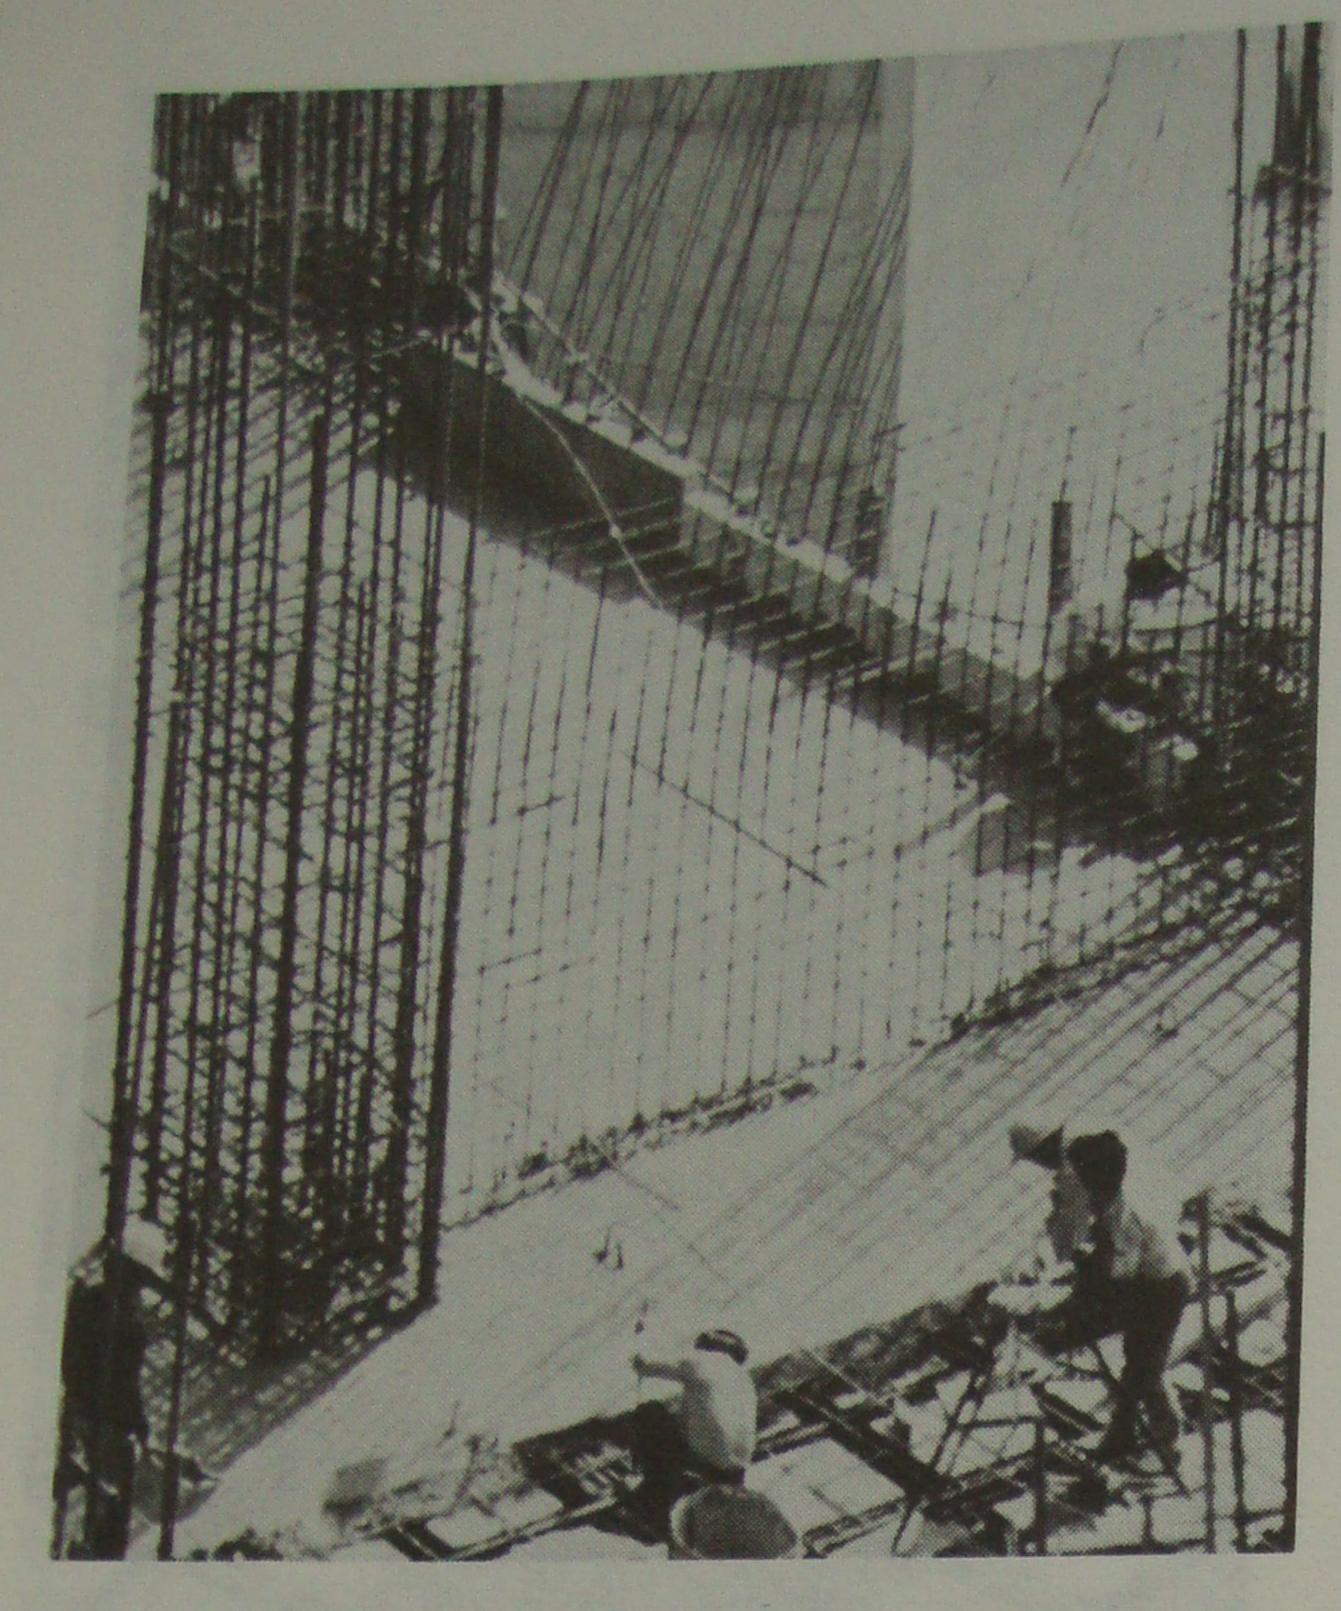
Shear wall reinforcement details in Nikko Hotel.
